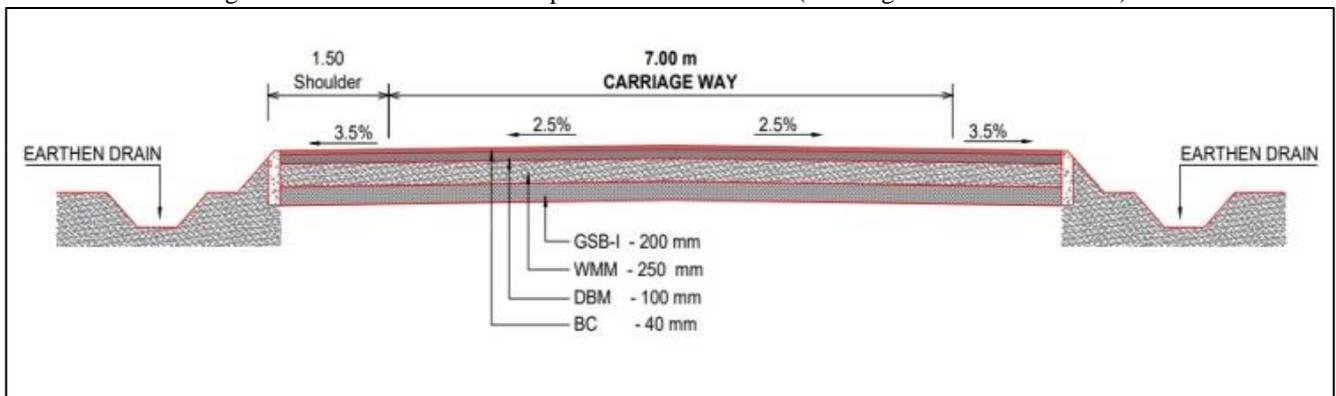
Cross-section of flexible pavement for section-2 (Chainage: 06+000 to 12+000)
